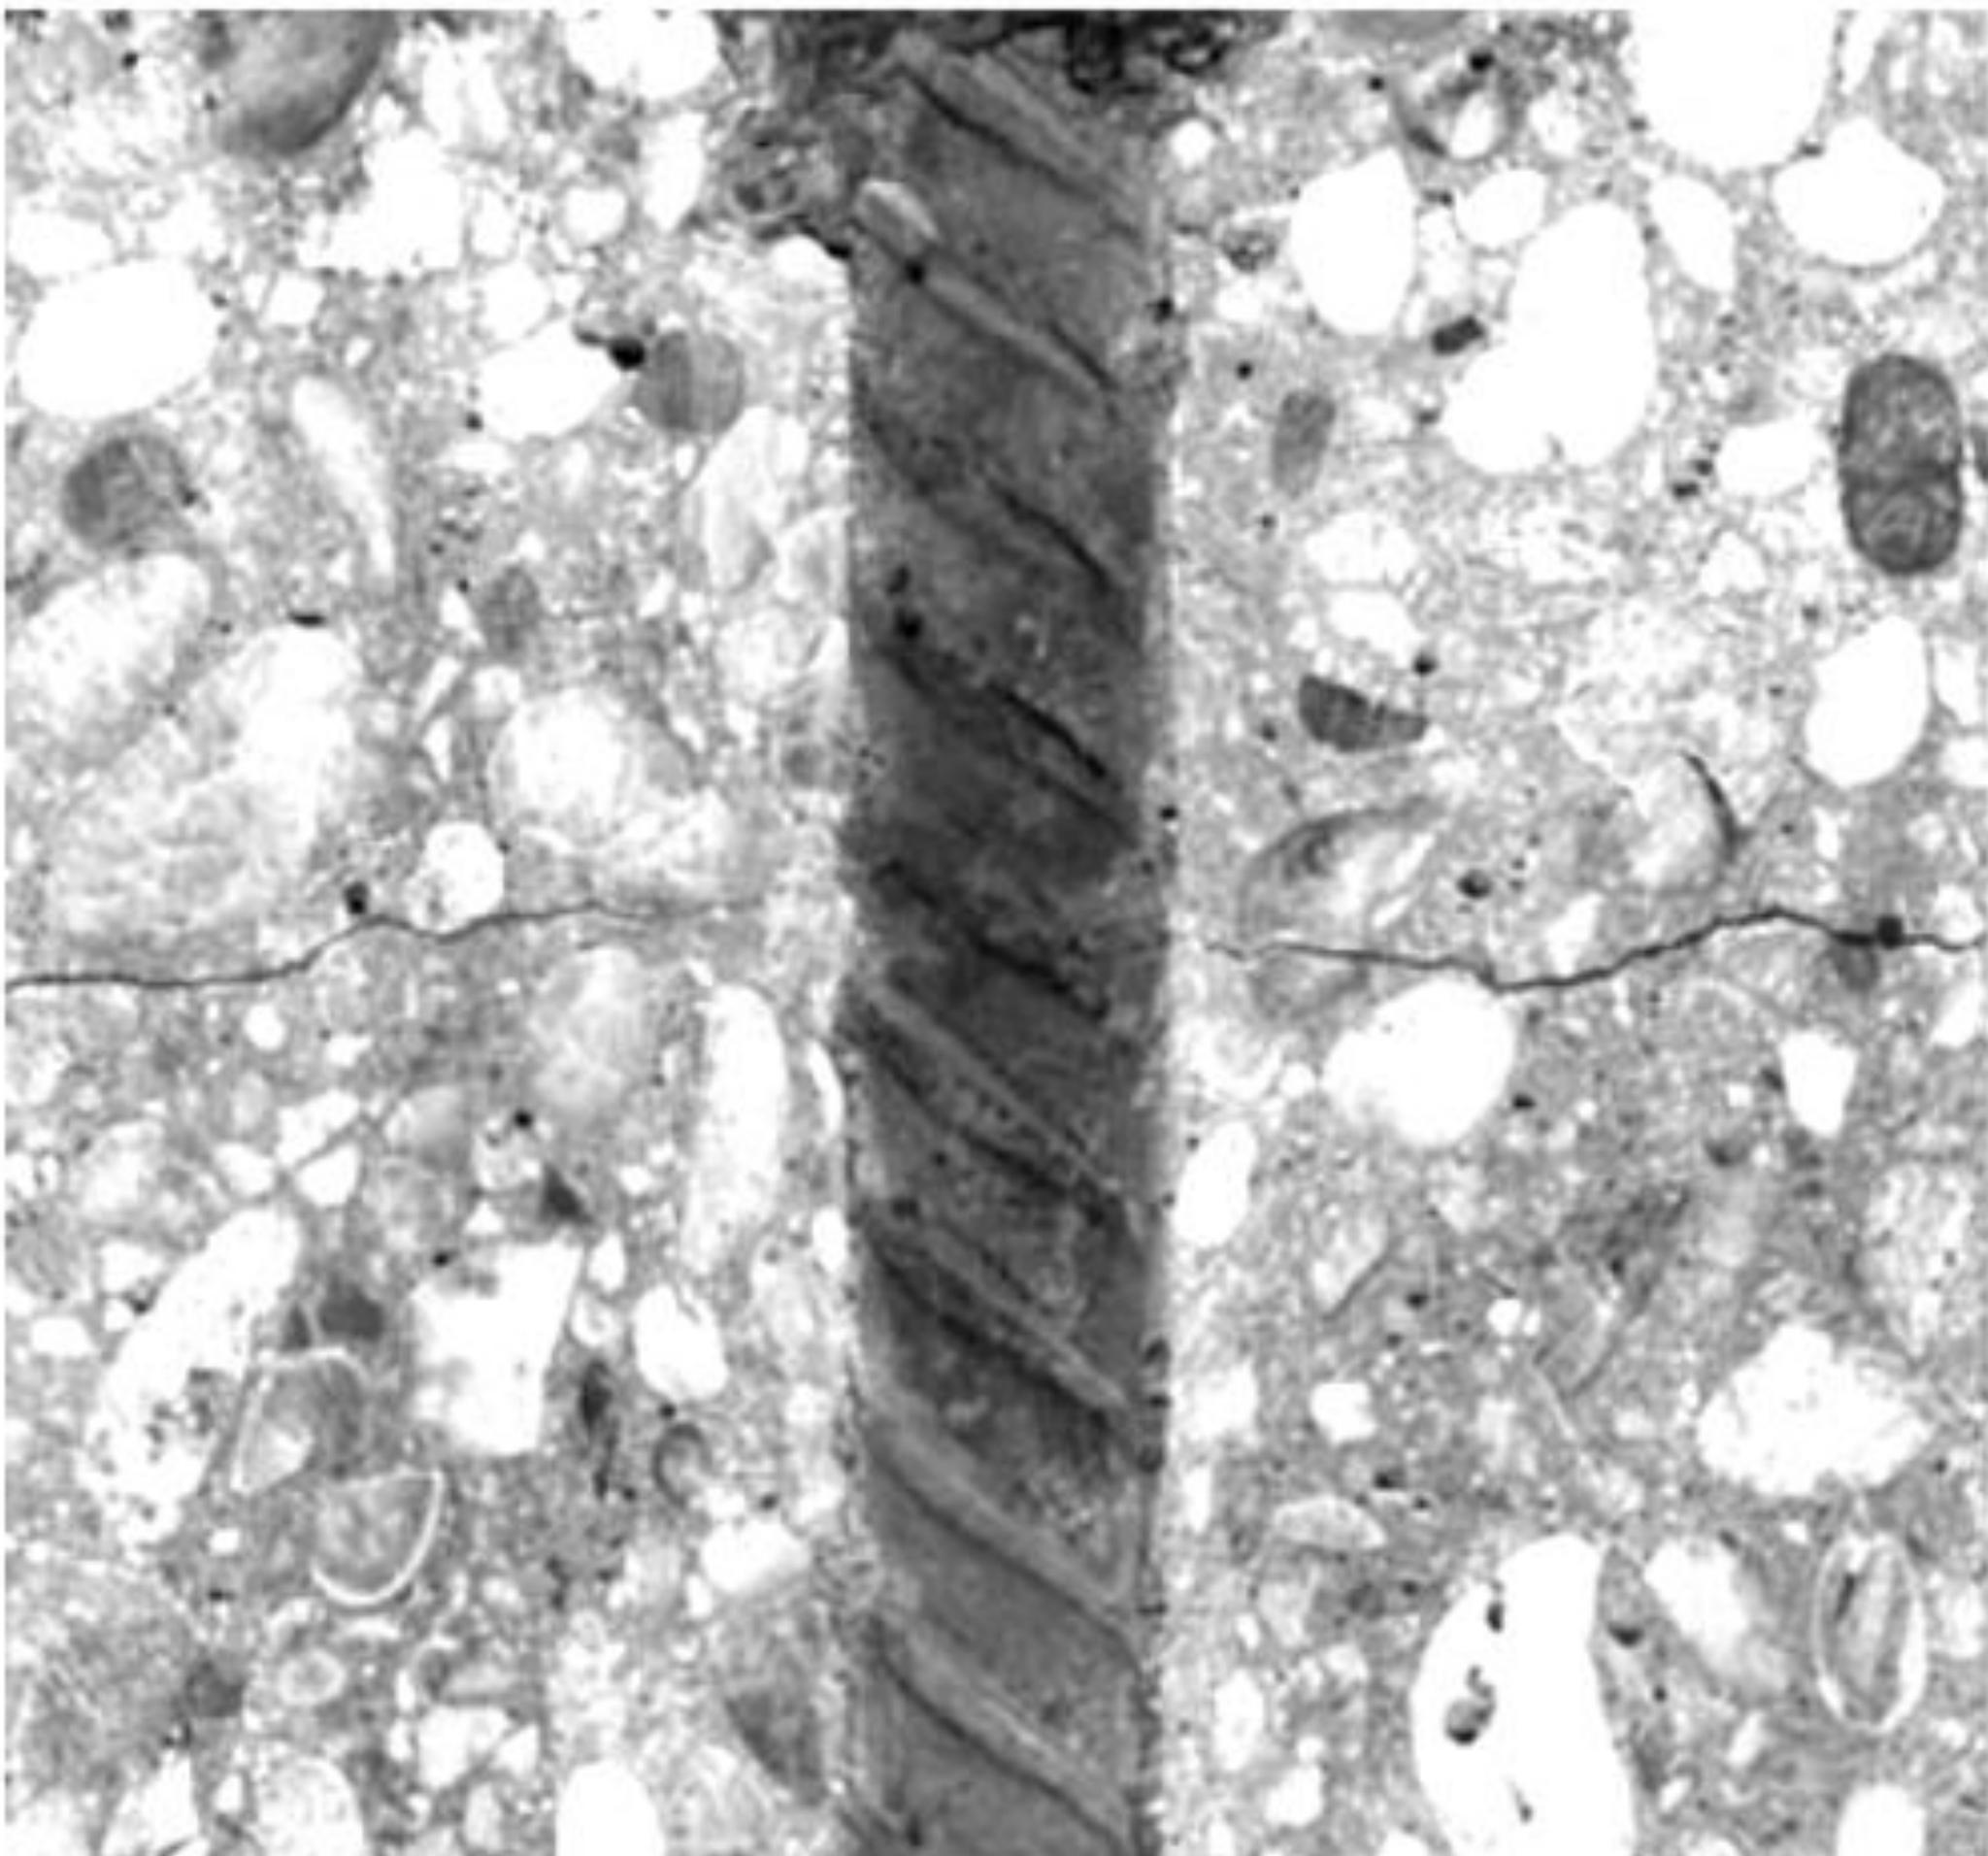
Variation of crack width for specimen with concentric steel reinforcement (concrete cover of 50 mm)
